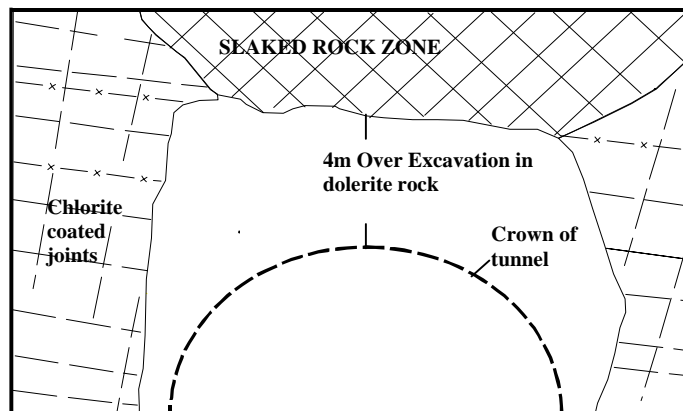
Geological section of the draft tube tunnel passing through slaked dolerite rock.
